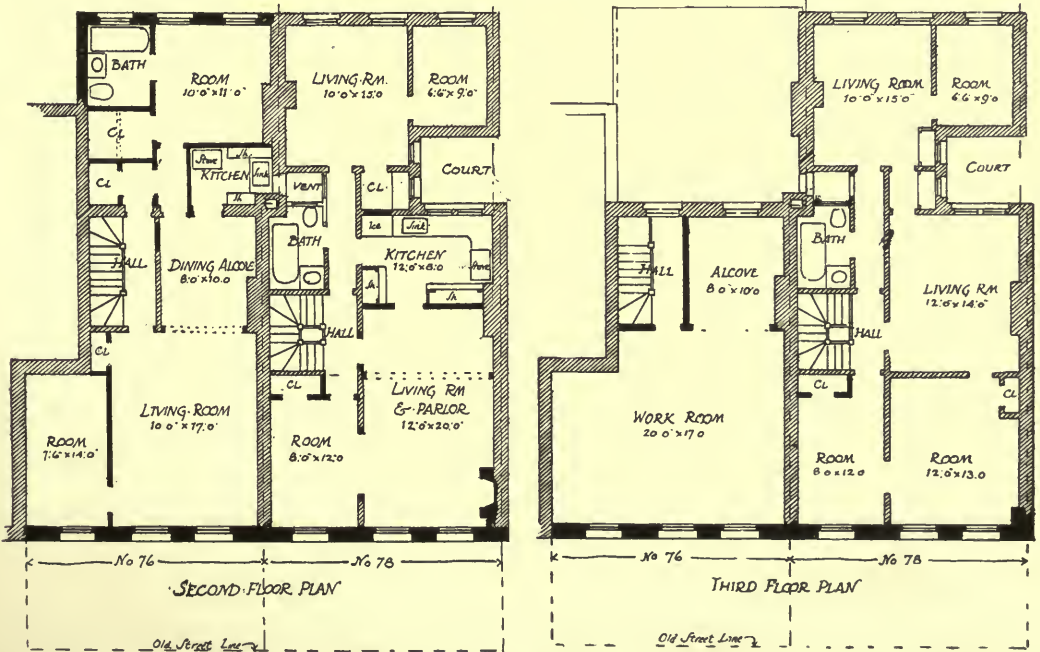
SECOND AND THIRD FLOOR PLAN—ALTERATION OF TWO OLD BUILDINGS ON BEACON HILL, BOSTON, TO BUSINESS, STUDIO AND APARTMENT USES.
